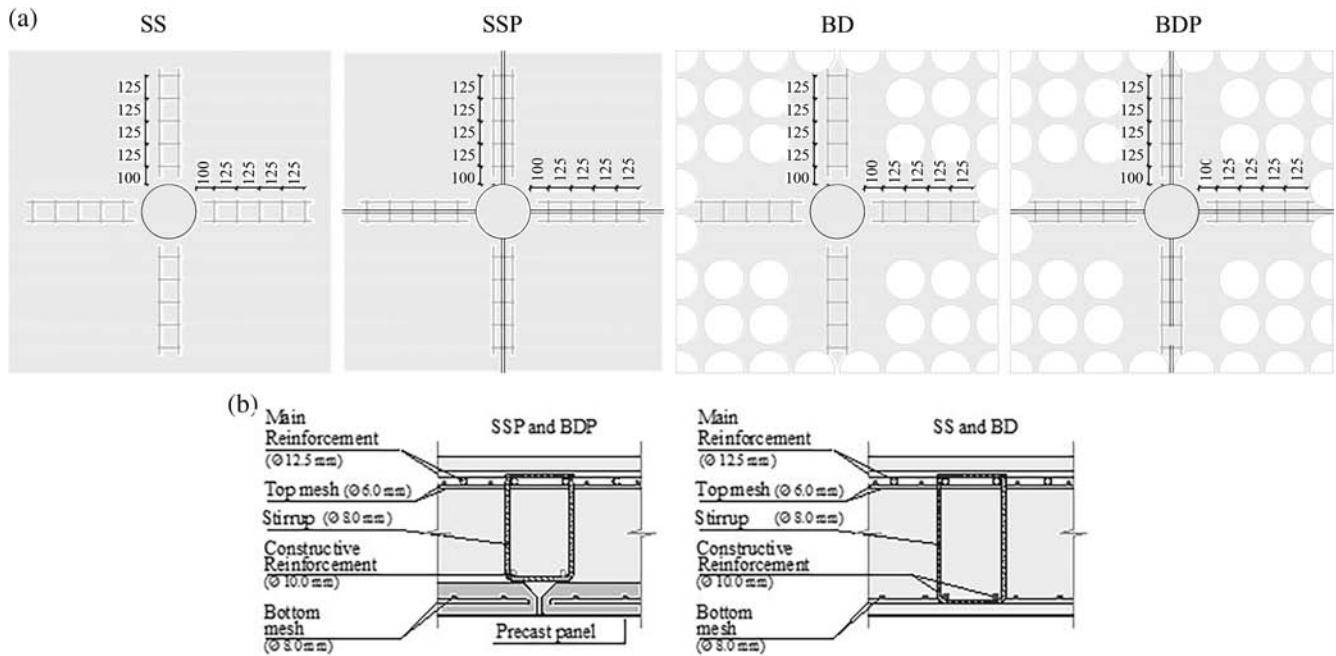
Details of the punching reinforcement: (a) plant view, (b) cross section (dimensions in mm)
